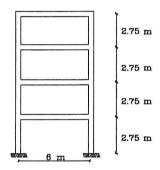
4-storey, 1-bay reinforced concrete frame.
